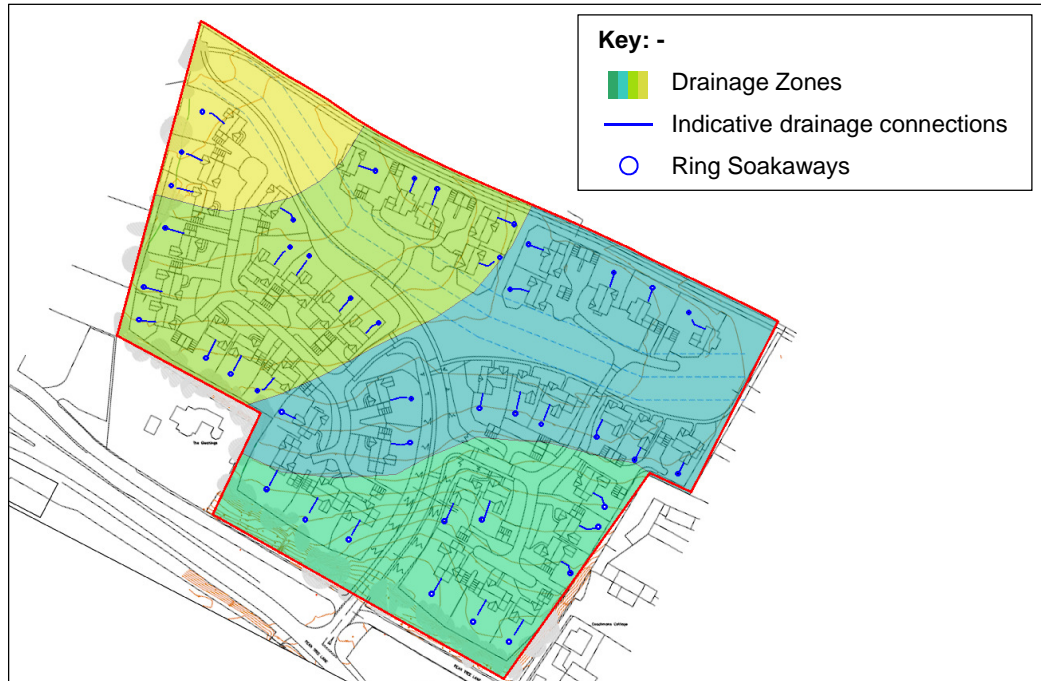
Indicative drainage layout plan delineating the potential location for soakaways across the site.
